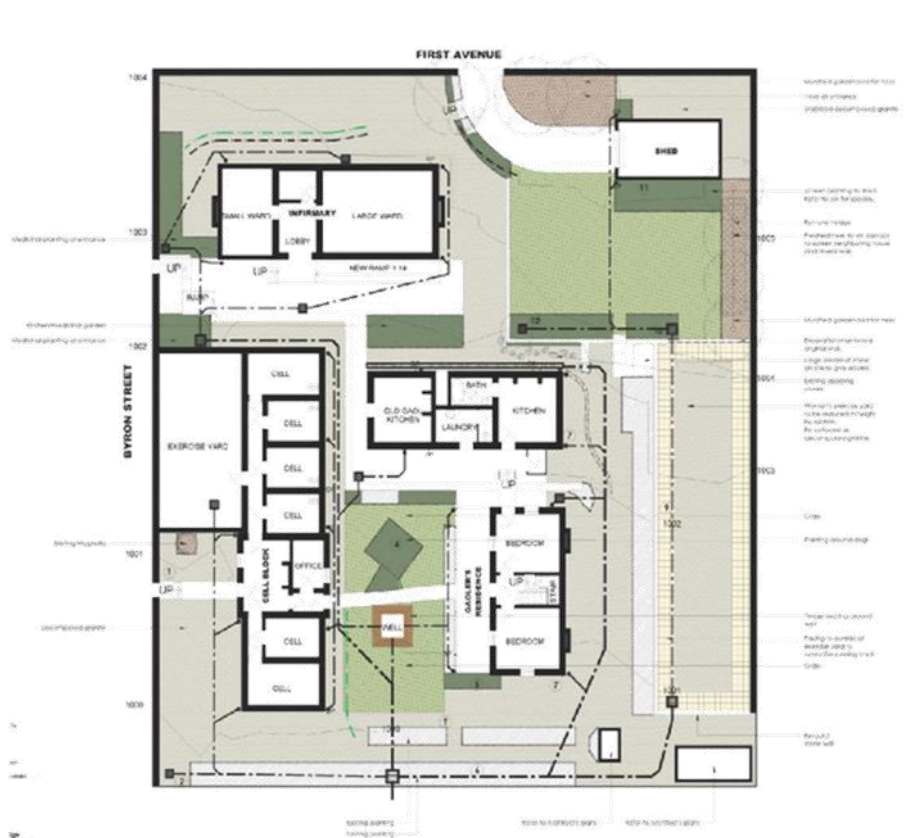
Somewhere Landscape Architects - Site Layout / Landscape Masterplan Drawing.
